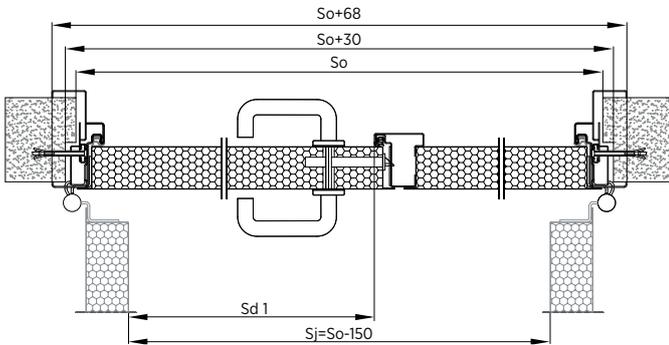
Installation of the double-leaf door to a masonry wall - corner frame with a thermal break - horizontal cross-section
